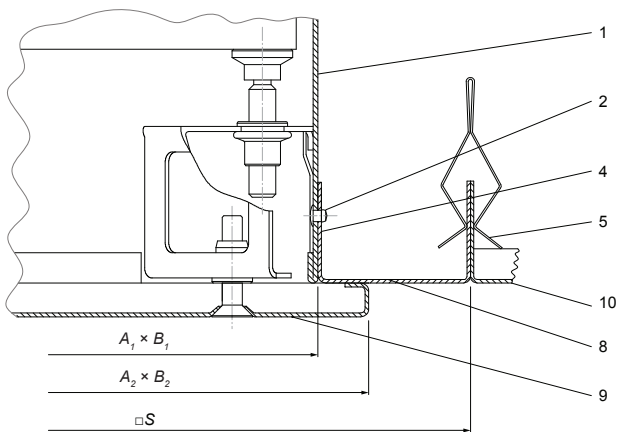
Mounting of the clean filtering cassettes with the type 1 front panel fitting surface into a suspension metal plate ceiling.
